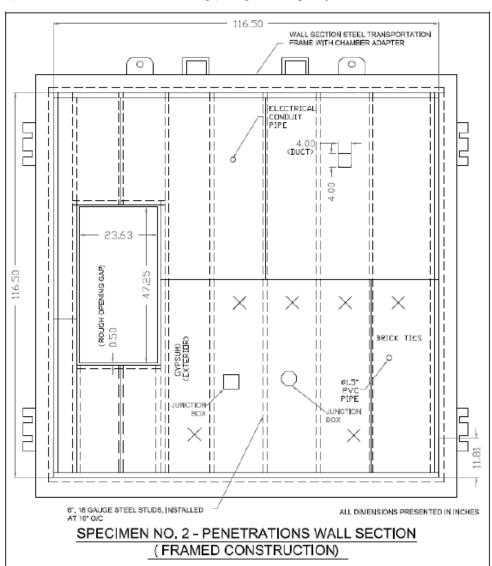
Element Specimen 20-06-B0040-SS-PT-2 Gauge Locations
